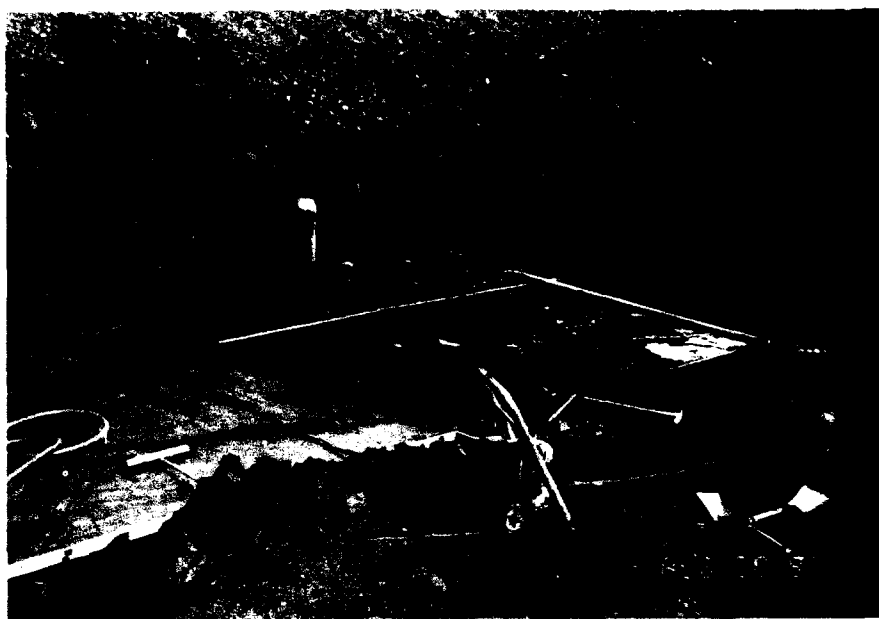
Spillway wall footing R-15. Note wheel mounted piece of equipment in lower portion of Photo with angle of form boards immediately behind. Form board angle and foundation fracture trend are those of previous Photos. Fractures in the darker shale to the right (upstream) in the upstream portion of R-15 dip downstream (to the left).
